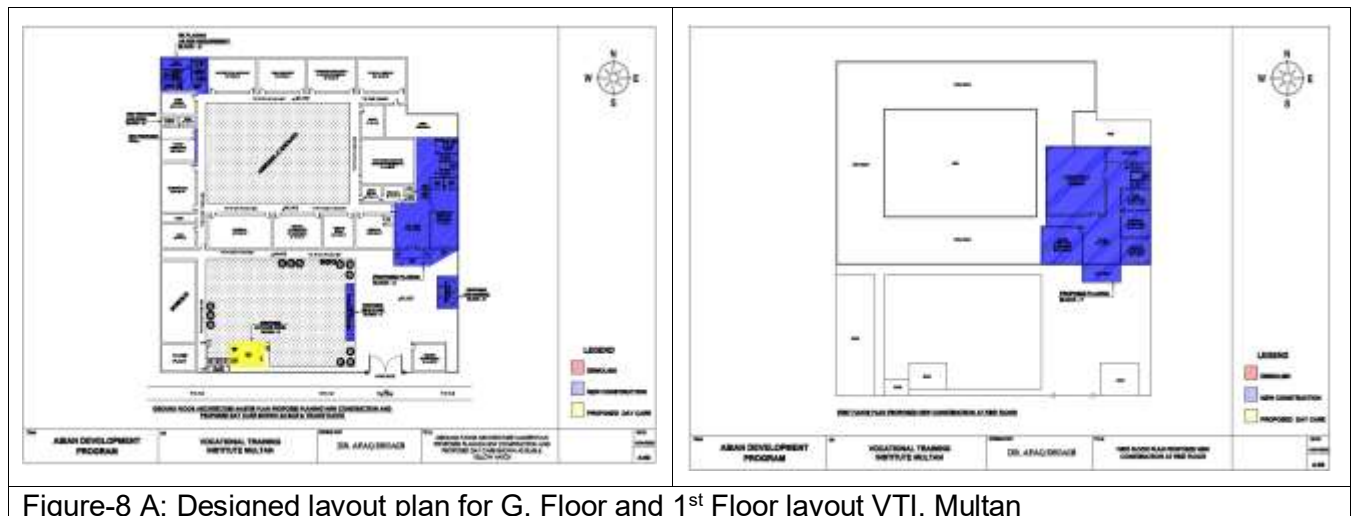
A: Designed layout plan for G. Floor and 1st Floor layout VTI, Multan
